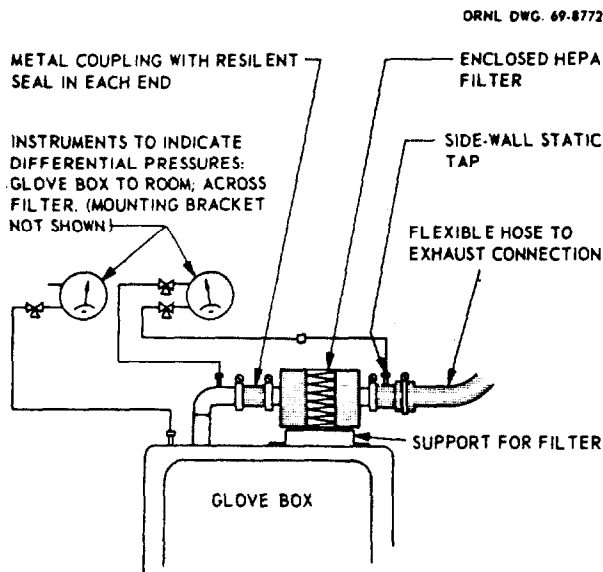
Installation of an enclosed HEPA filter mounted outside the glove box.
